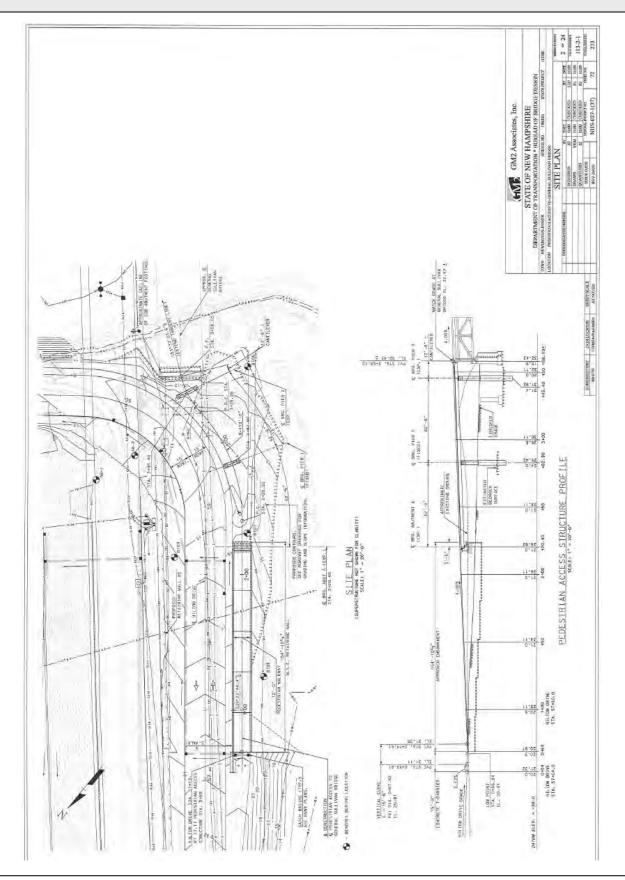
2009 plans for the new north bridge approach and abutment modification, Site Plan.
